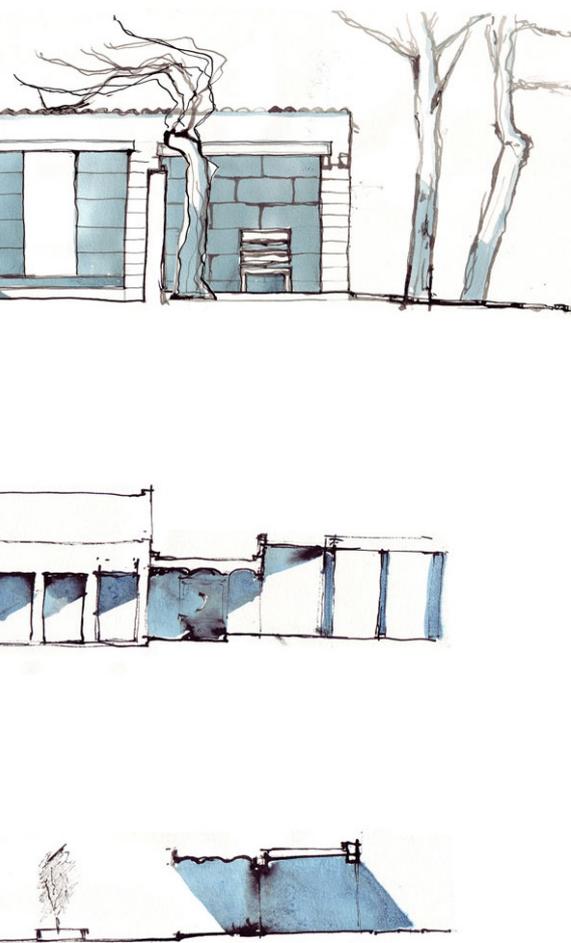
In situ sketch sections and plans of Can Lis (SH).
